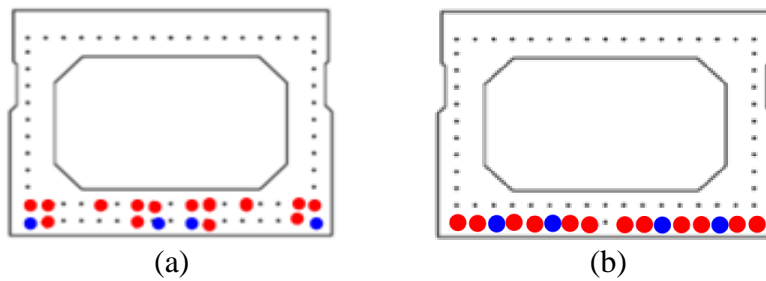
Strand configuration in (a) interior and (b) exterior box beam of Bridge 7722 determined with rebar scanner
